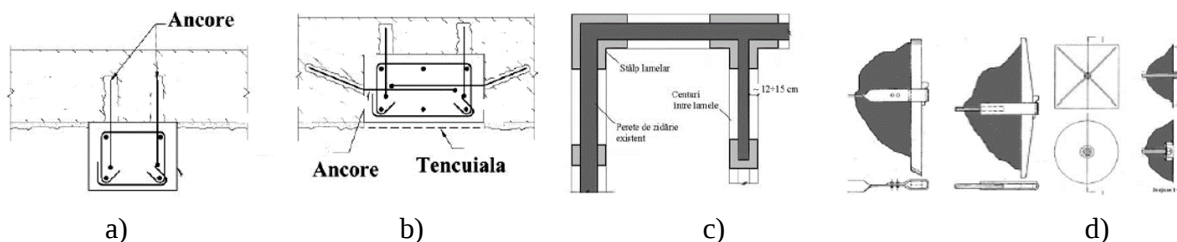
Consolidation of masonry structures with reinforced concrete pillars and belts - a) external pillar, apparent; b) pillar embedded in the masonry and with a thickness less than that of the wall; c) Consolidation of masonry with lamellar pillars; d) Tie rod anchor parts (anchor plates) with aesthetic forms [1, 97]
